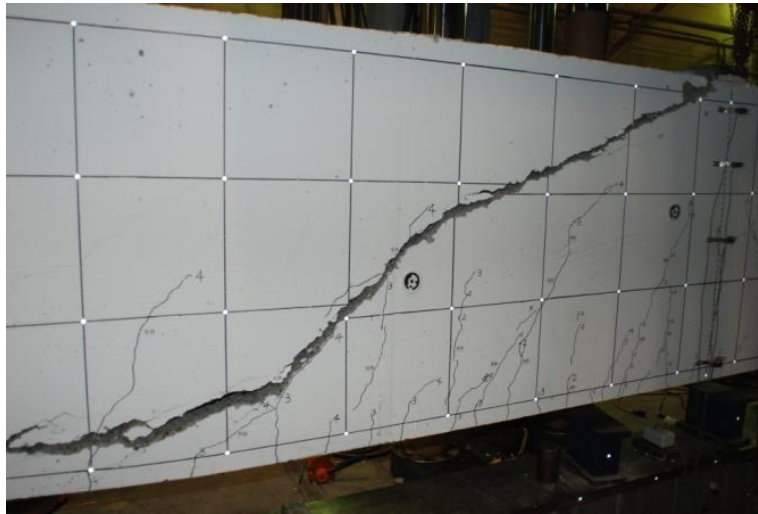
Overall Failure Crack on South Face of S1000-B1
